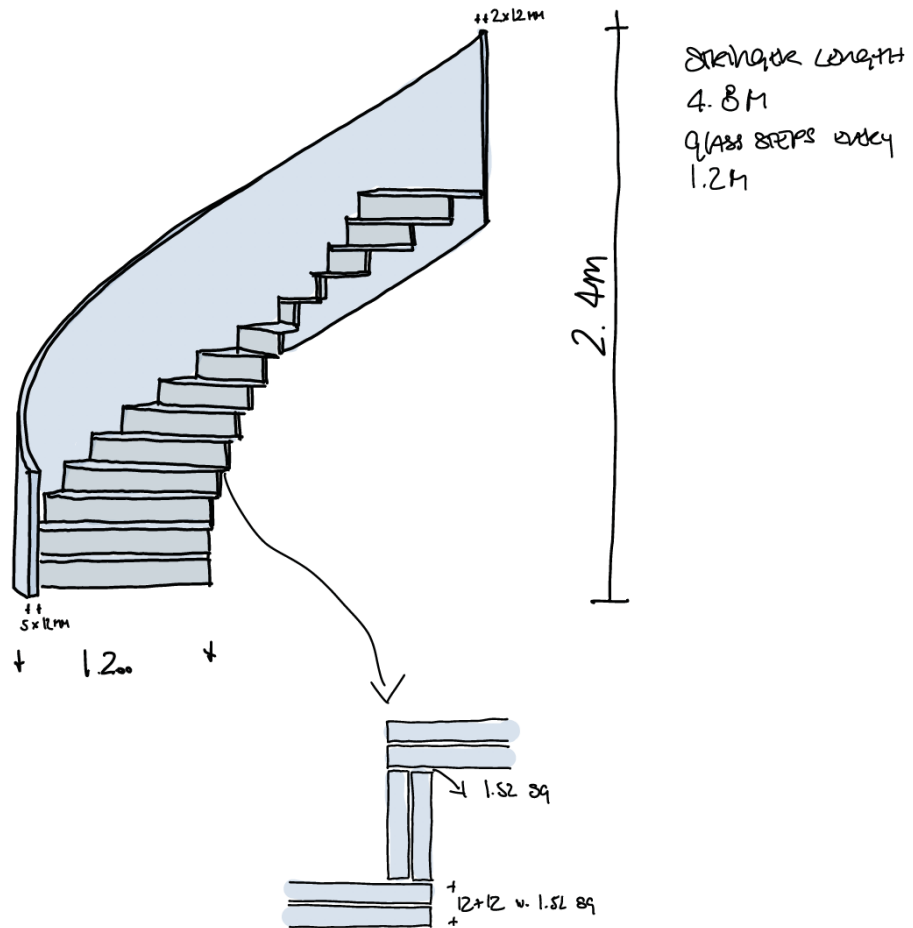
Sketch of updated stair concept based on a palladian cantilevered stone staircase.
